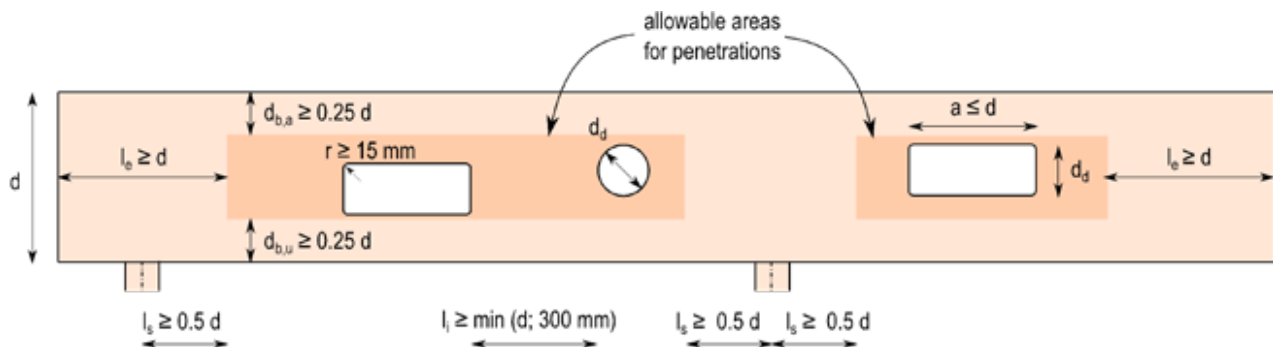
Geometrical limitations for beams with reinforced penetrations.
